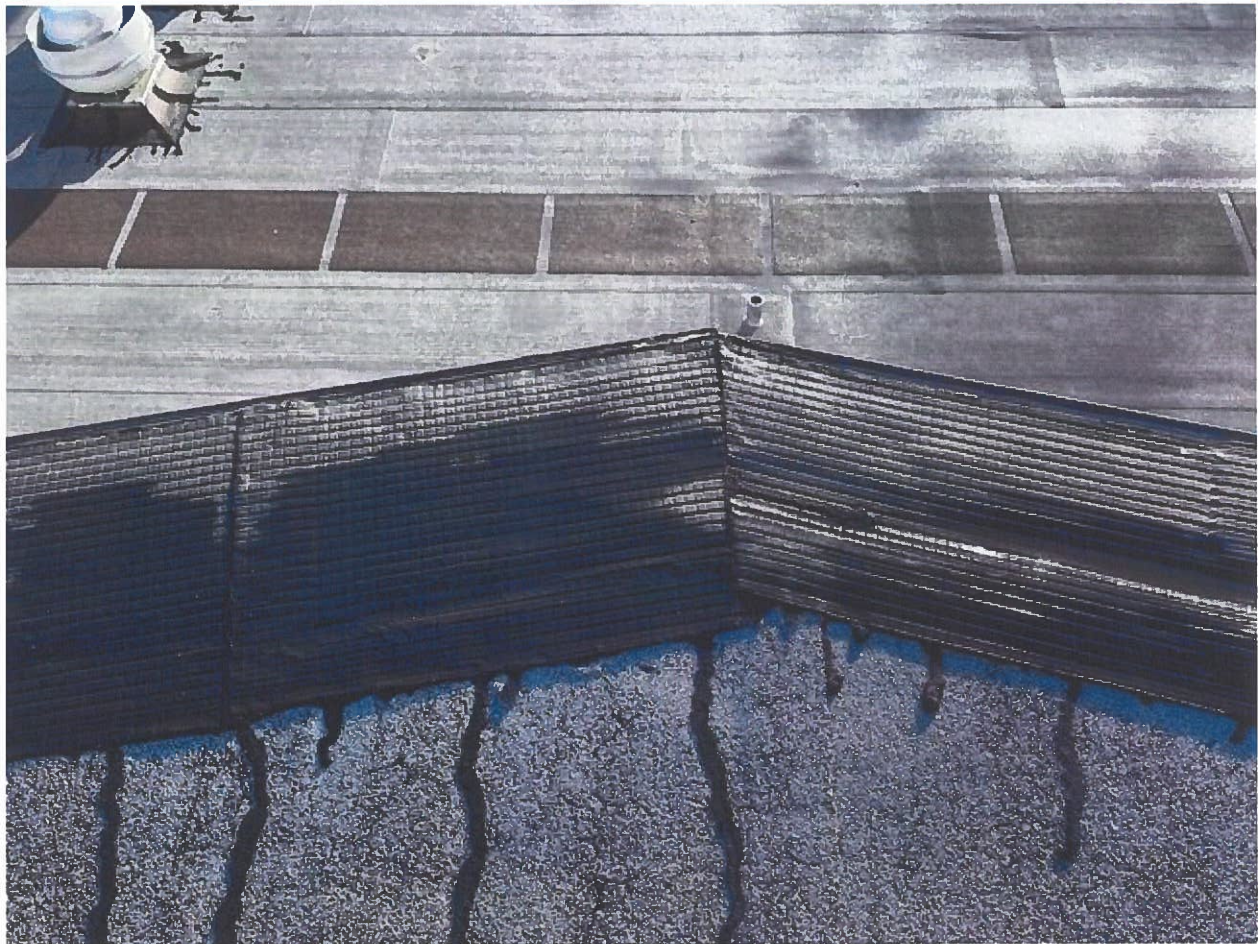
A combination of design details, flashing, and water proof membrane result in water damage to architectural features. We observed repeated efforts to repair these conditions throughout the original building.
